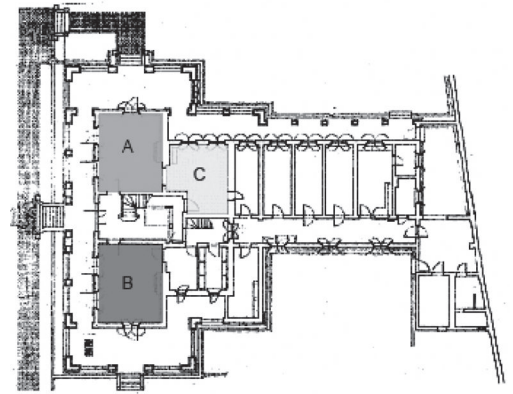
The floor plan of the consul's residence in Fort San Domingo.
